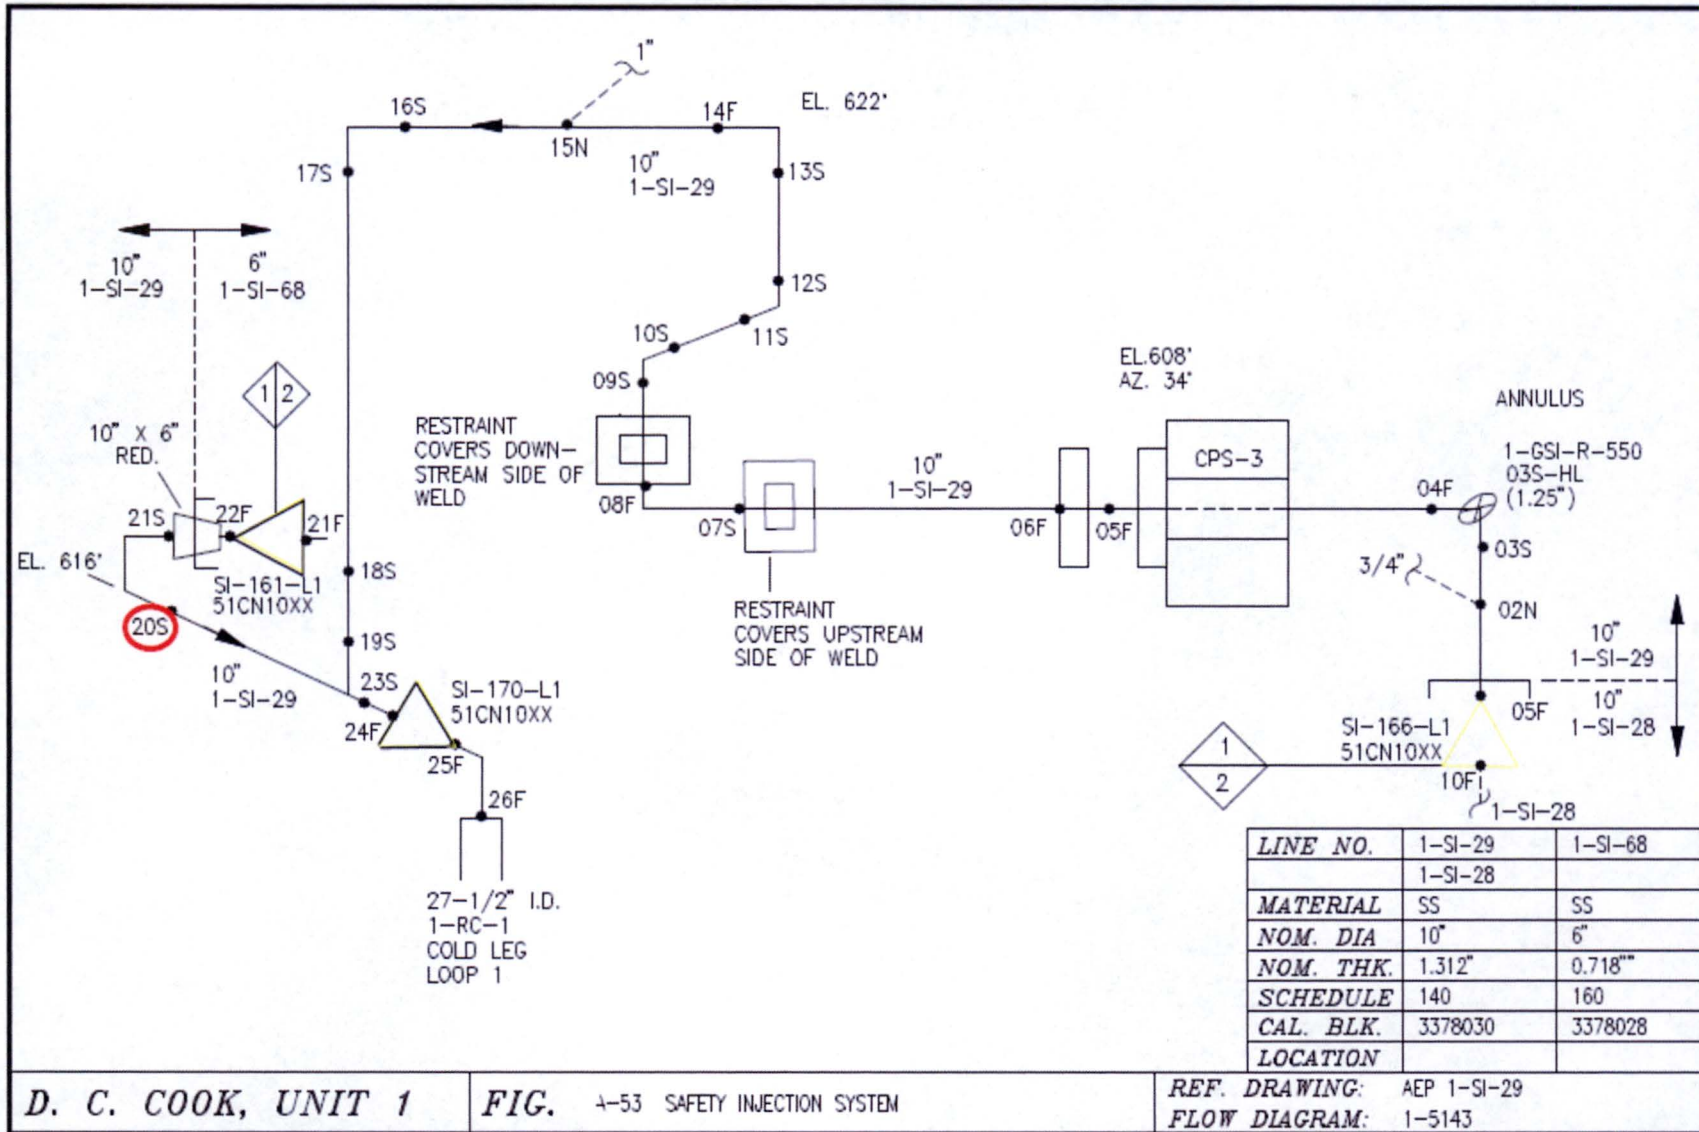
Weld 1-SI-29-20S (Extracted from Reference DRAWING A-53)
